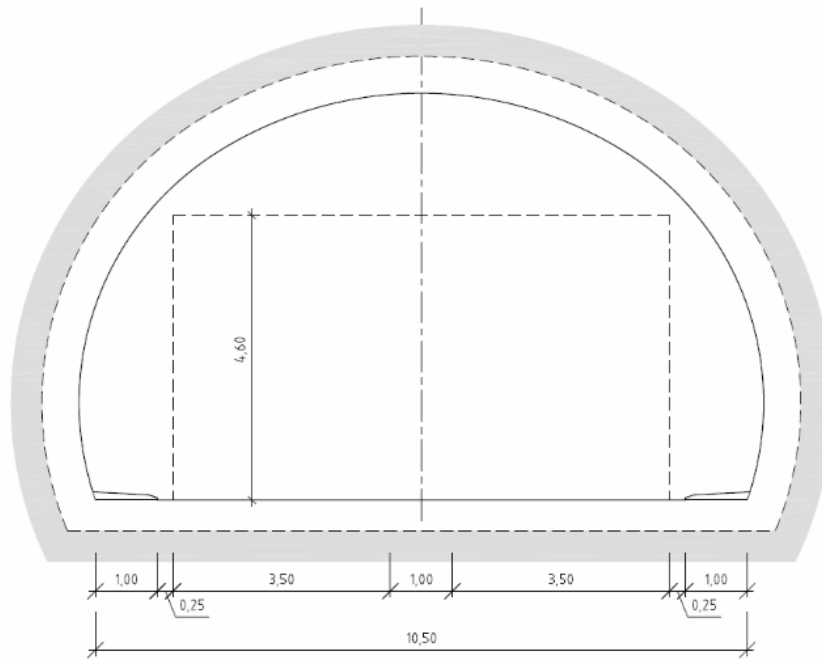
Tunnel profile T 10,5 (StatensVegvesen, 2014)
